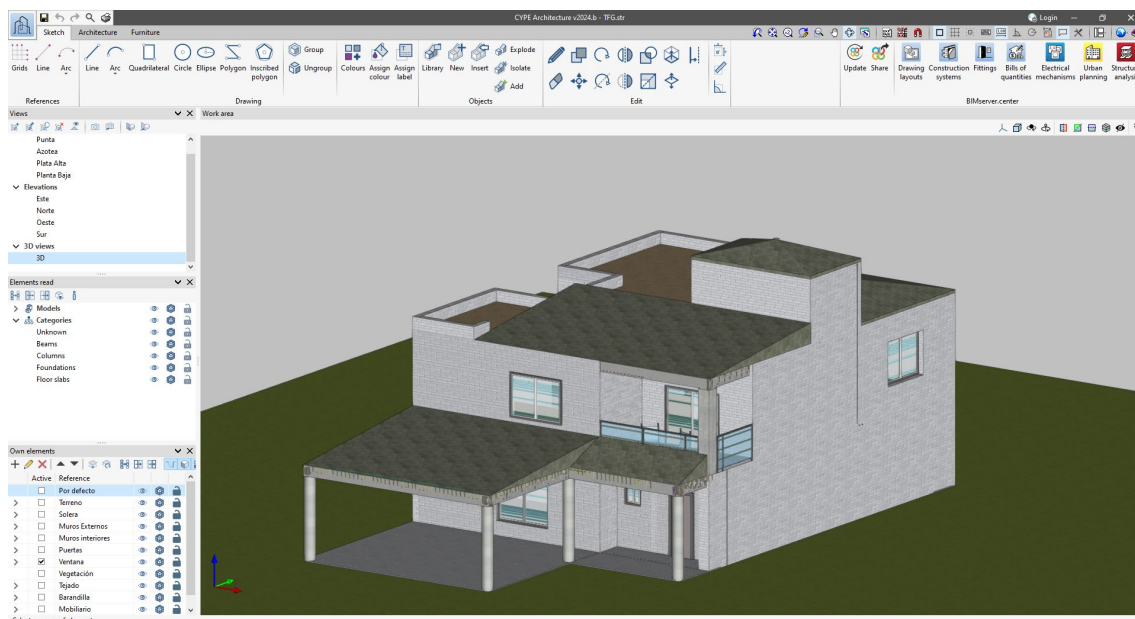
Architectural elements of the concrete structure house in Cype Architecture.
